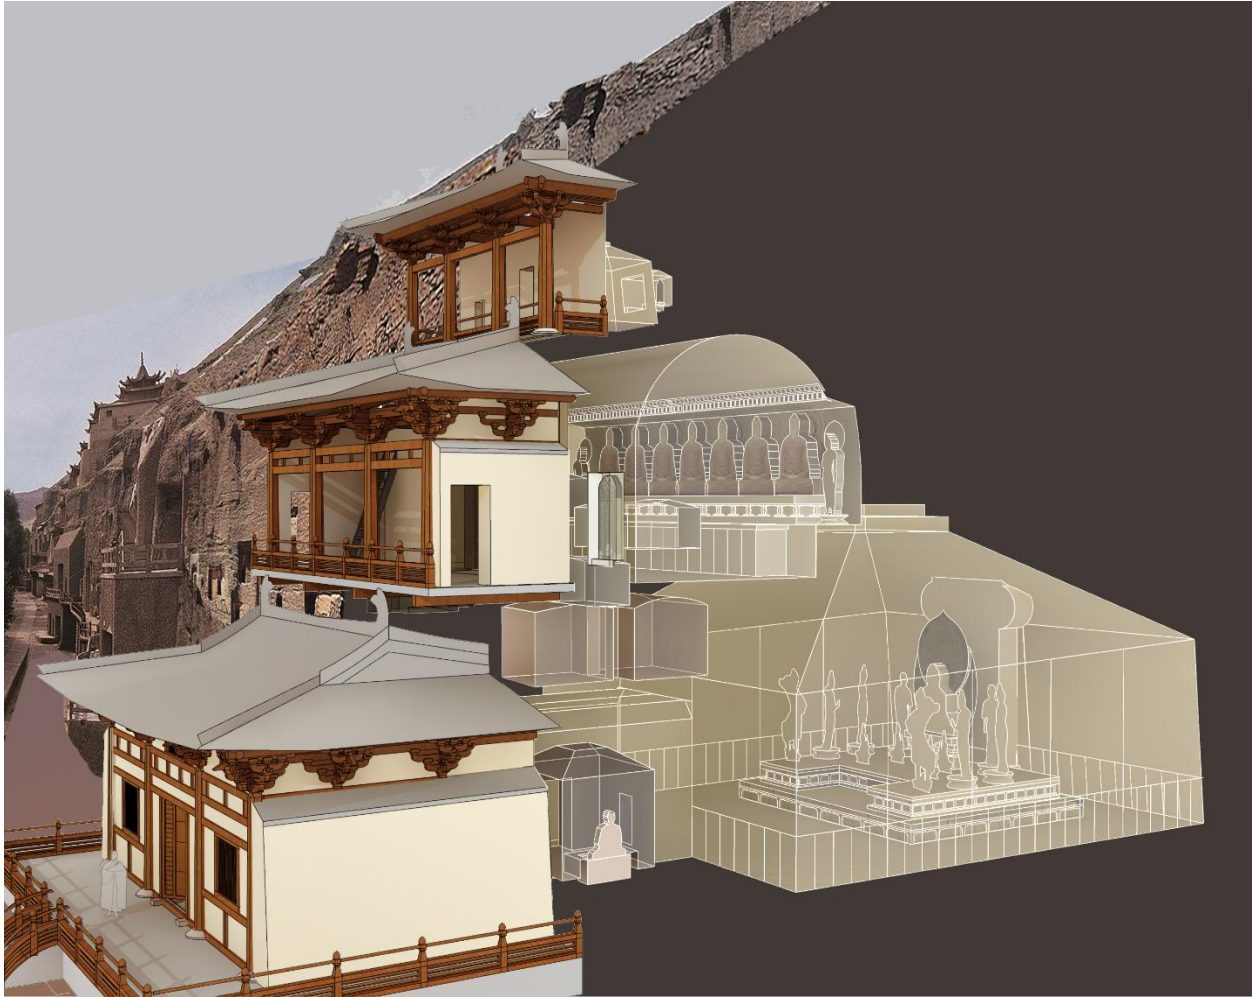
The author's reconstruction of Phase 3 in the construction history of the Pavilion. Cave Suite 16/17 was constructed in the late-Tang period. Drawing by author.
